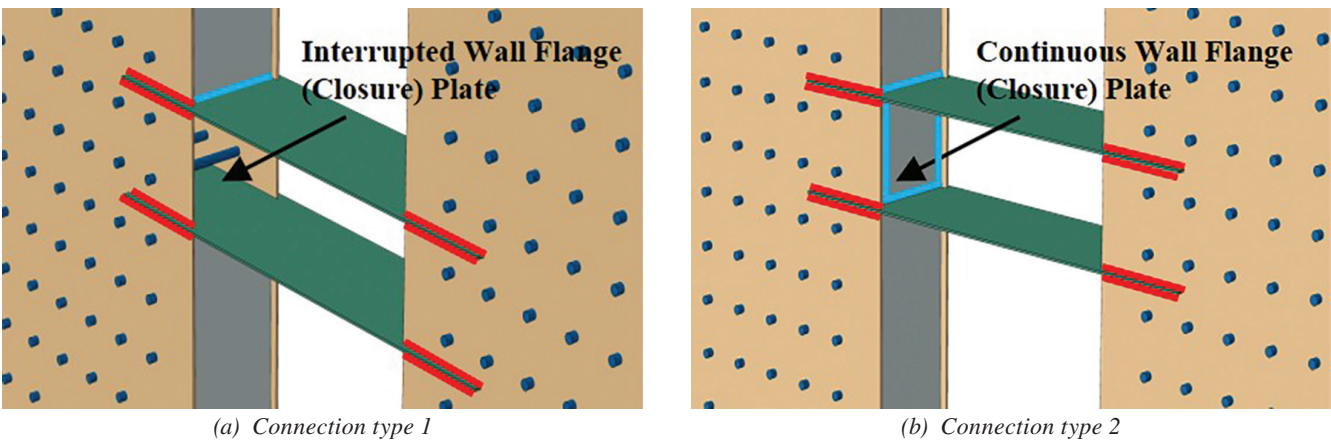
Details of connection type 1 and type 2 (beam web plates are hidden).
